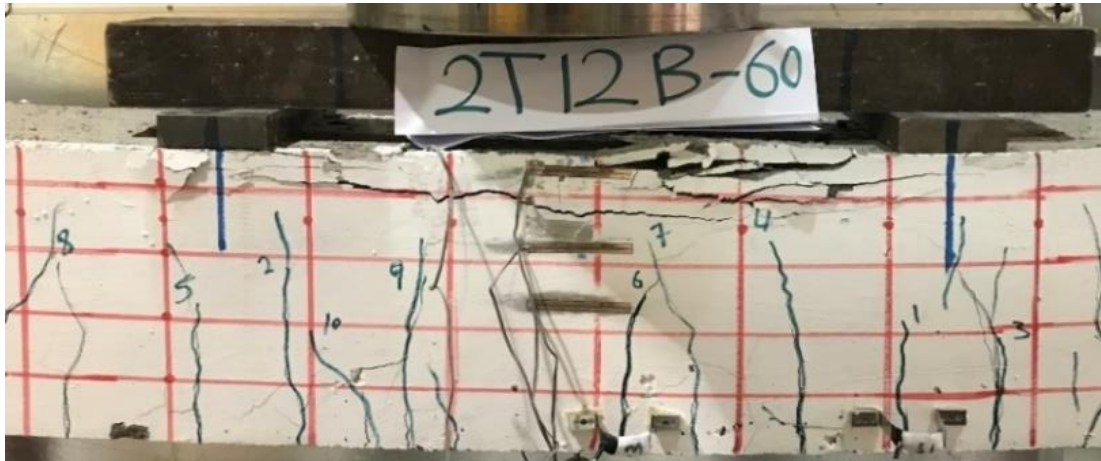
Failure modes of concrete beams reinforced with BFRP bars, beams cast with  $f'_c=30$  MPa
